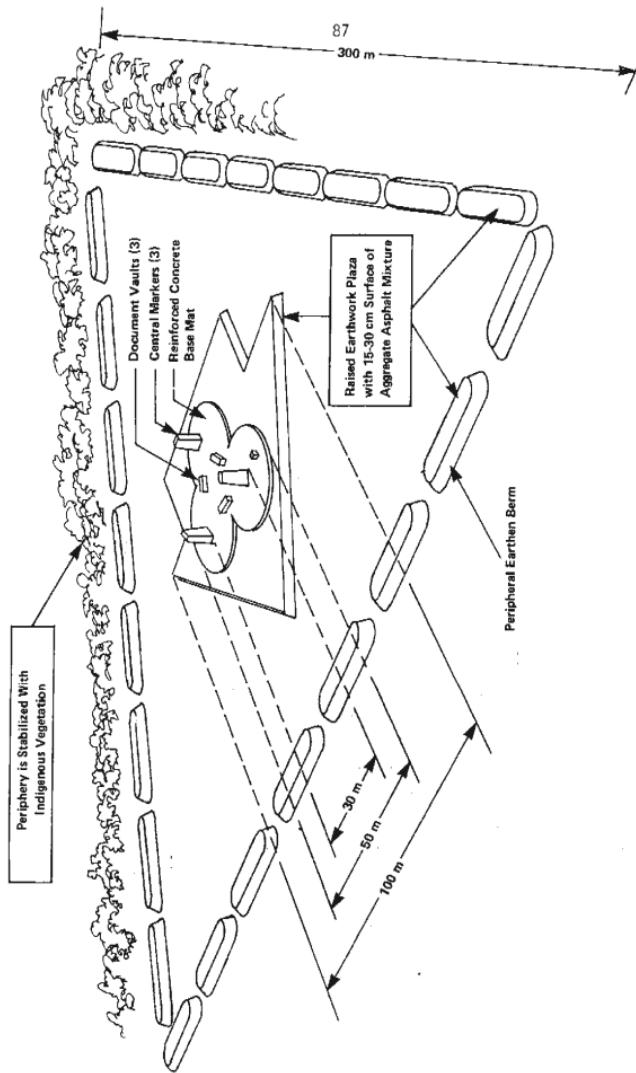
TYPICAL CENTRAL MONUMENT PLAZA
